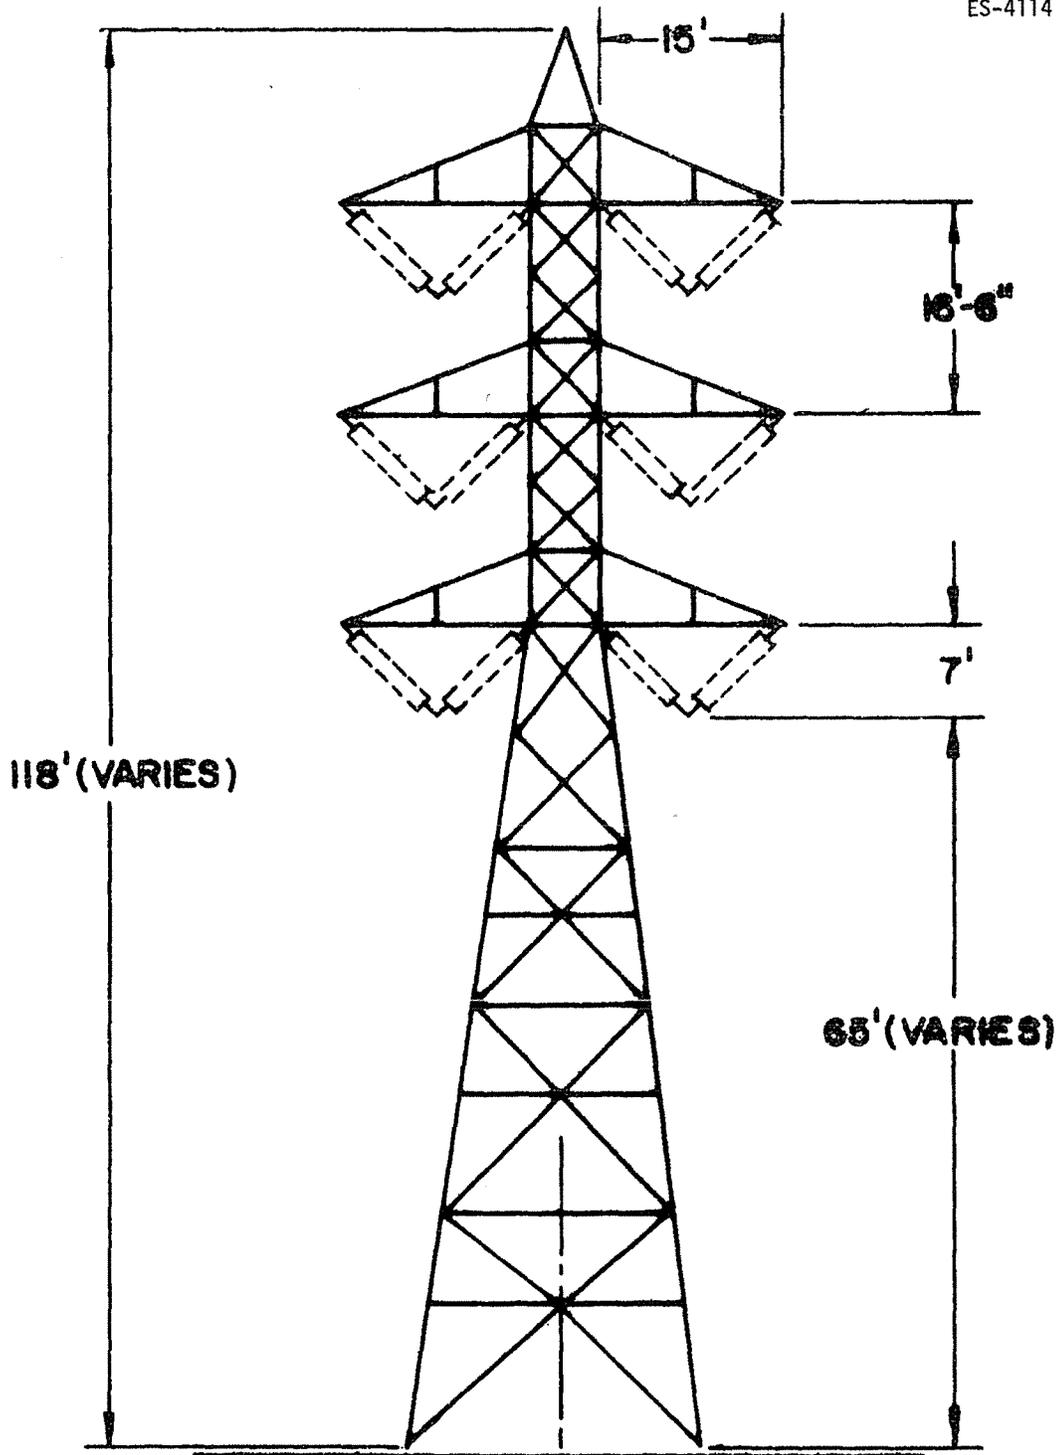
Typical steel lattice tower design used by San Diego Gas and Electric Company.
